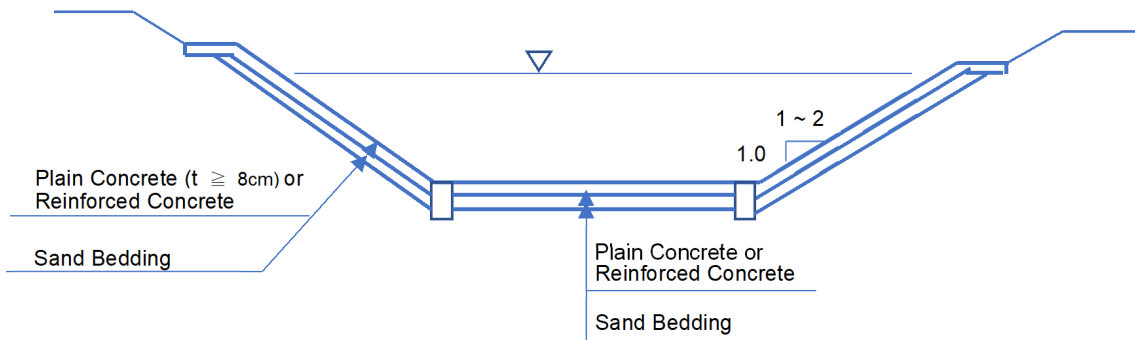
Typical Cross-Section of Concrete Lining Canal
